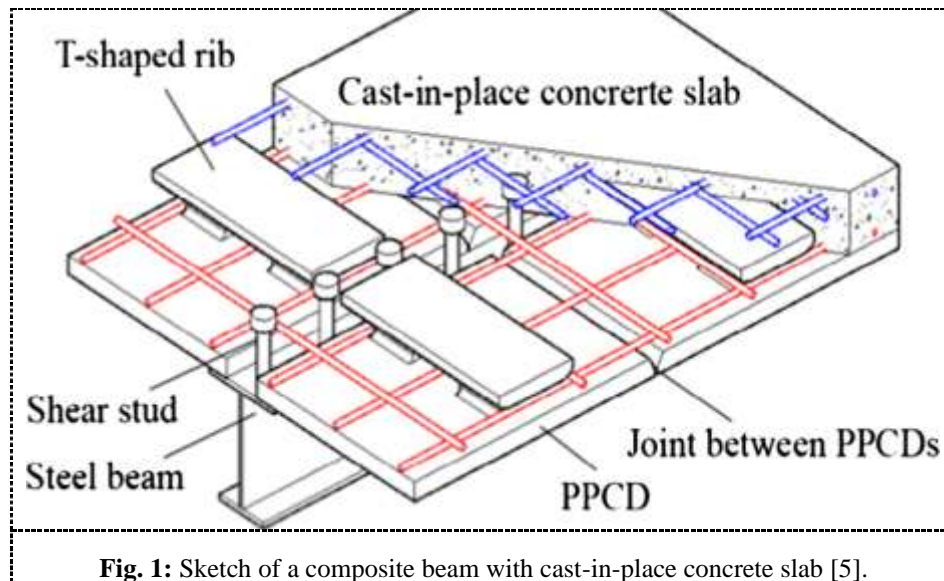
Sketch of a composite beam with cast-in-place concrete slab [5].
